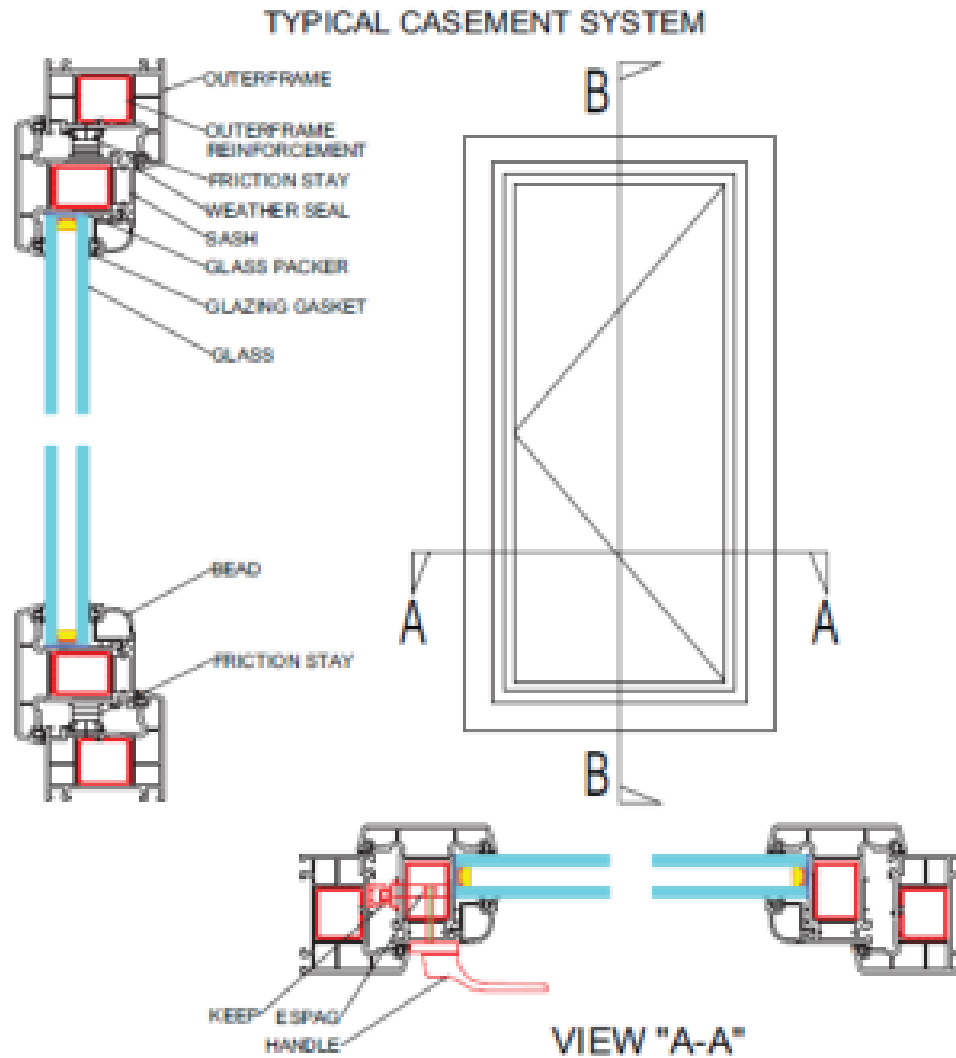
uPVC Doors & Windows (Typical Casement System)
